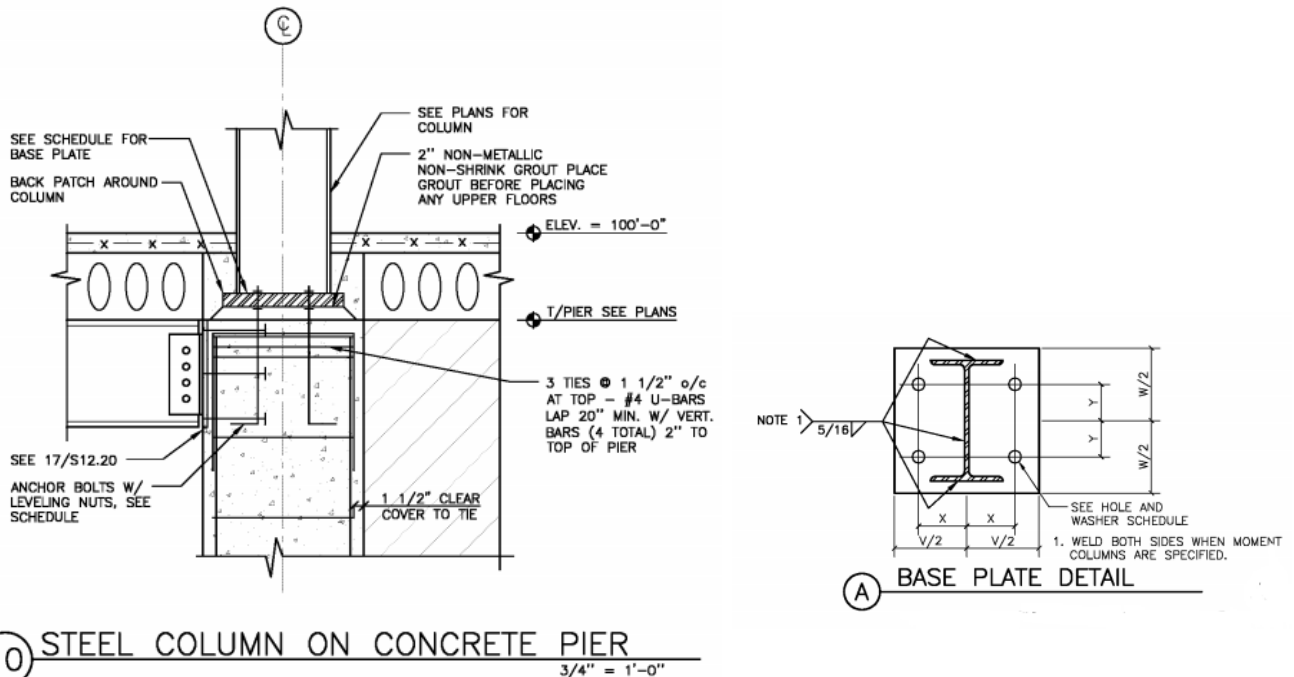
Steel Column on Concrete Pier and Base Plate Detail (S12.22 Drawing 10, S13.3 Drawing A)
